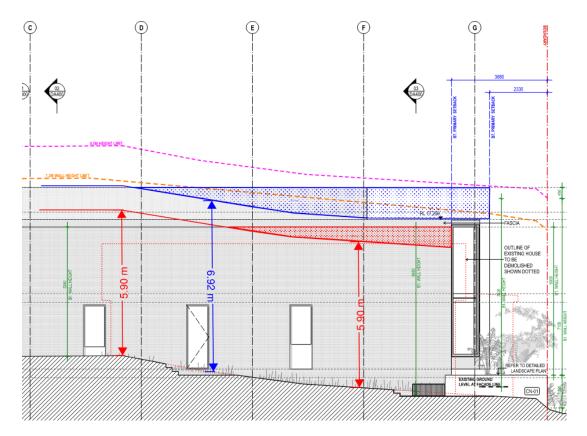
the extent of the proposed boundary envelope exceedance (excerpt from architectural plans)
